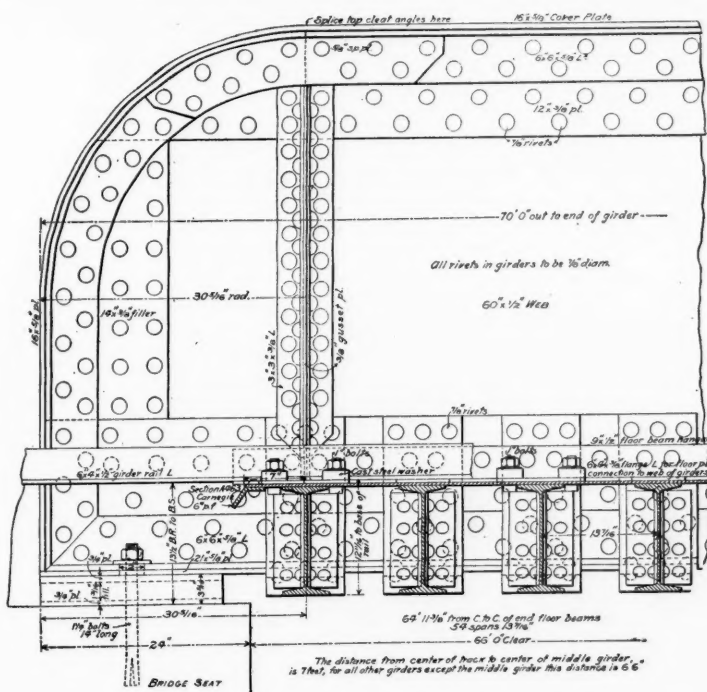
Partial Elevation and Section of 66-Ft. Clear Span Bridge—Track Elevation in Chicago.
